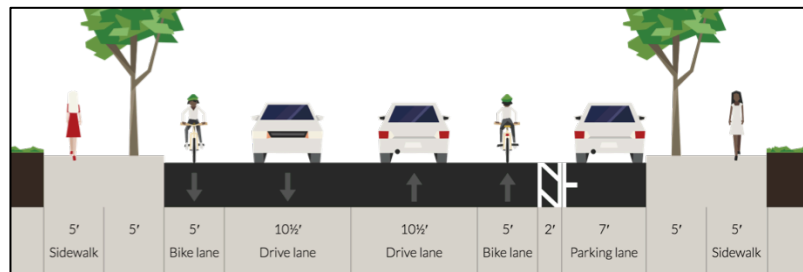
40-foot paved width with bike lanes and one-side parking
